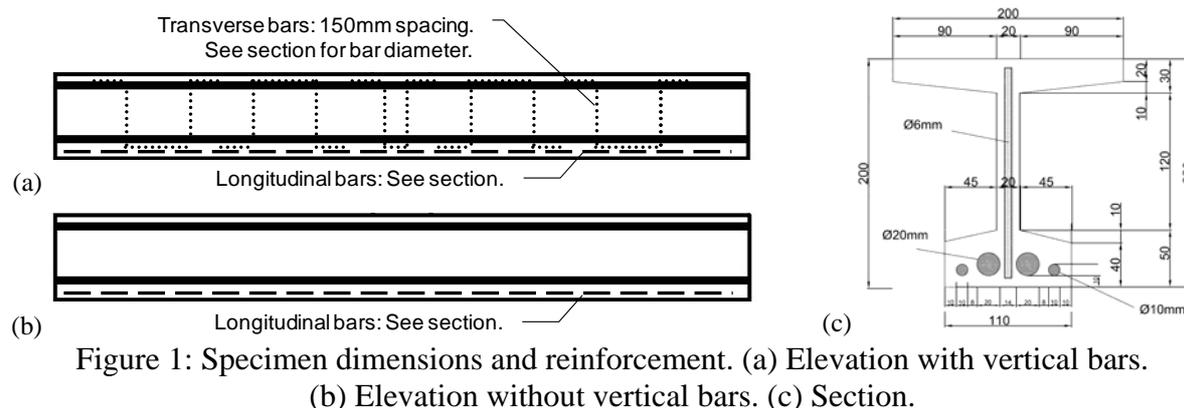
Specimen dimensions and reinforcement. (a) Elevation with vertical bars. (b) Elevation without vertical bars. (c) Section.
